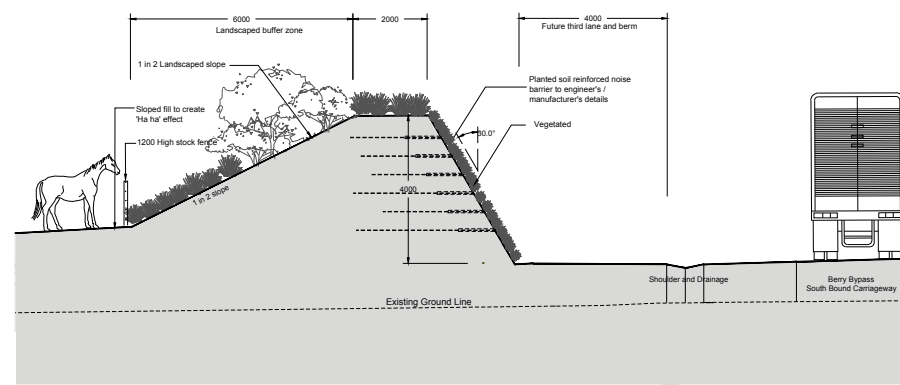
North Street noise barrier EA Concept Design option 2 – planted soil reinforced mound
